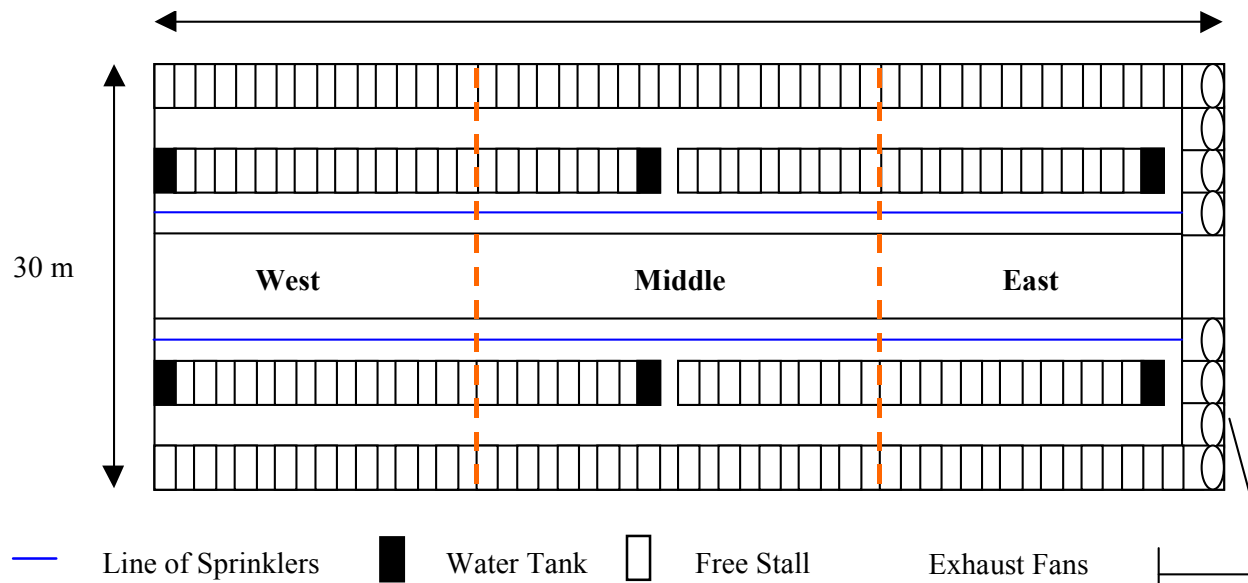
Tunnel ventilated barn with sprinkler evaporative cooling system.
